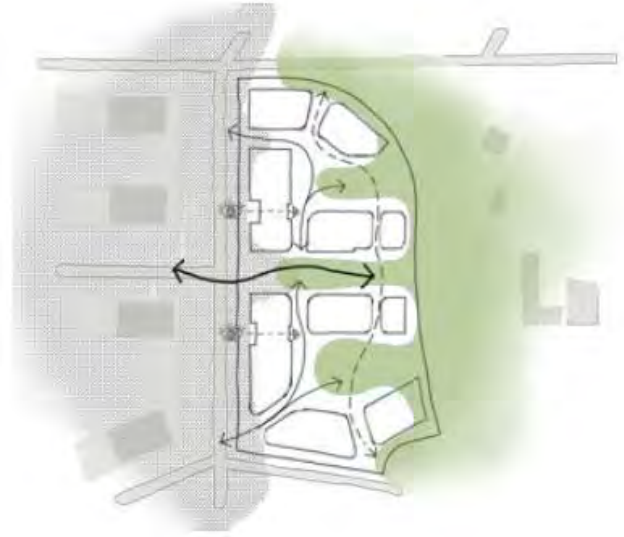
Conceptual SSDA site plan (current Collector Road alignment)
